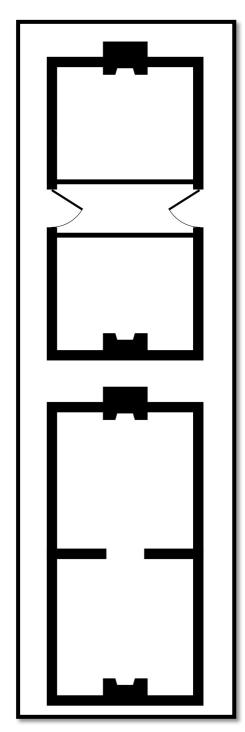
Possible Floor Plan. Focusing on the two southeastern rooms (A and B in Figure 150); the plan could have been two pens, one with an interior stacks, the other with an exterior stack, with a double pen or hall-parlor plan. Conversely, the house could have started as a central passage plan, as is shown in the top plan. The central passage plan was well-known and utilized in Harrison County in the first quarter of the nineteenth century.
